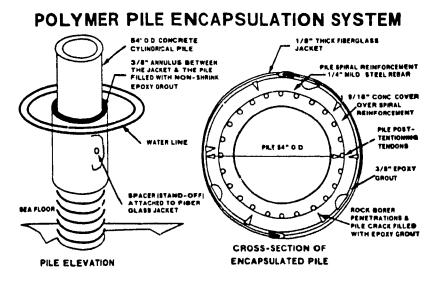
POLYMER ENCAPSULATION SYSTEM USED TO REPAIR CONCRETE CYLINDER PILES (ARABIAN GULF).<sup>7</sup>
